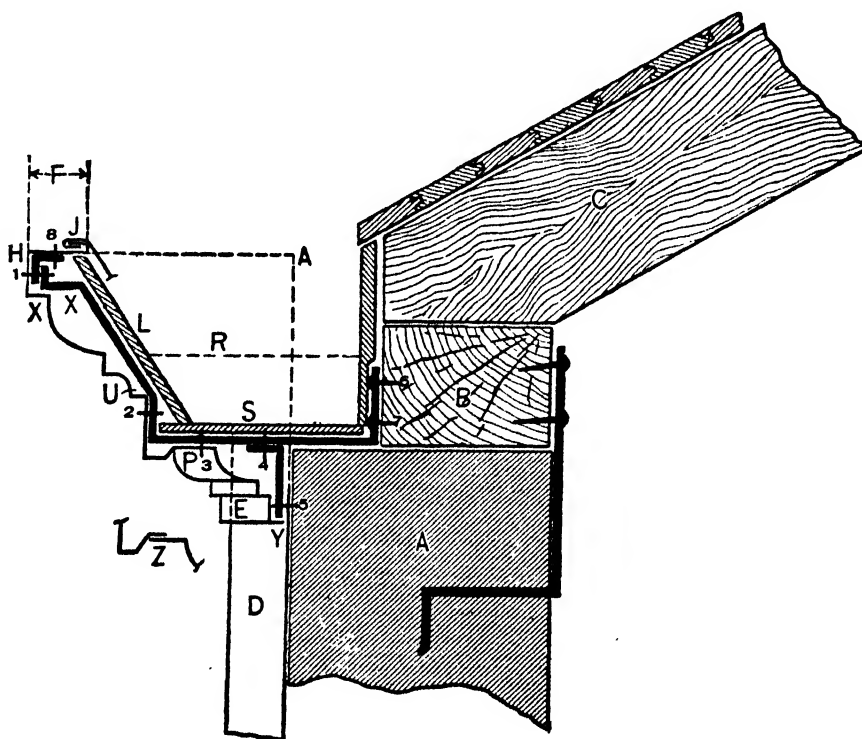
Fastening Sheet Metal Molding Against Wooden Plate
